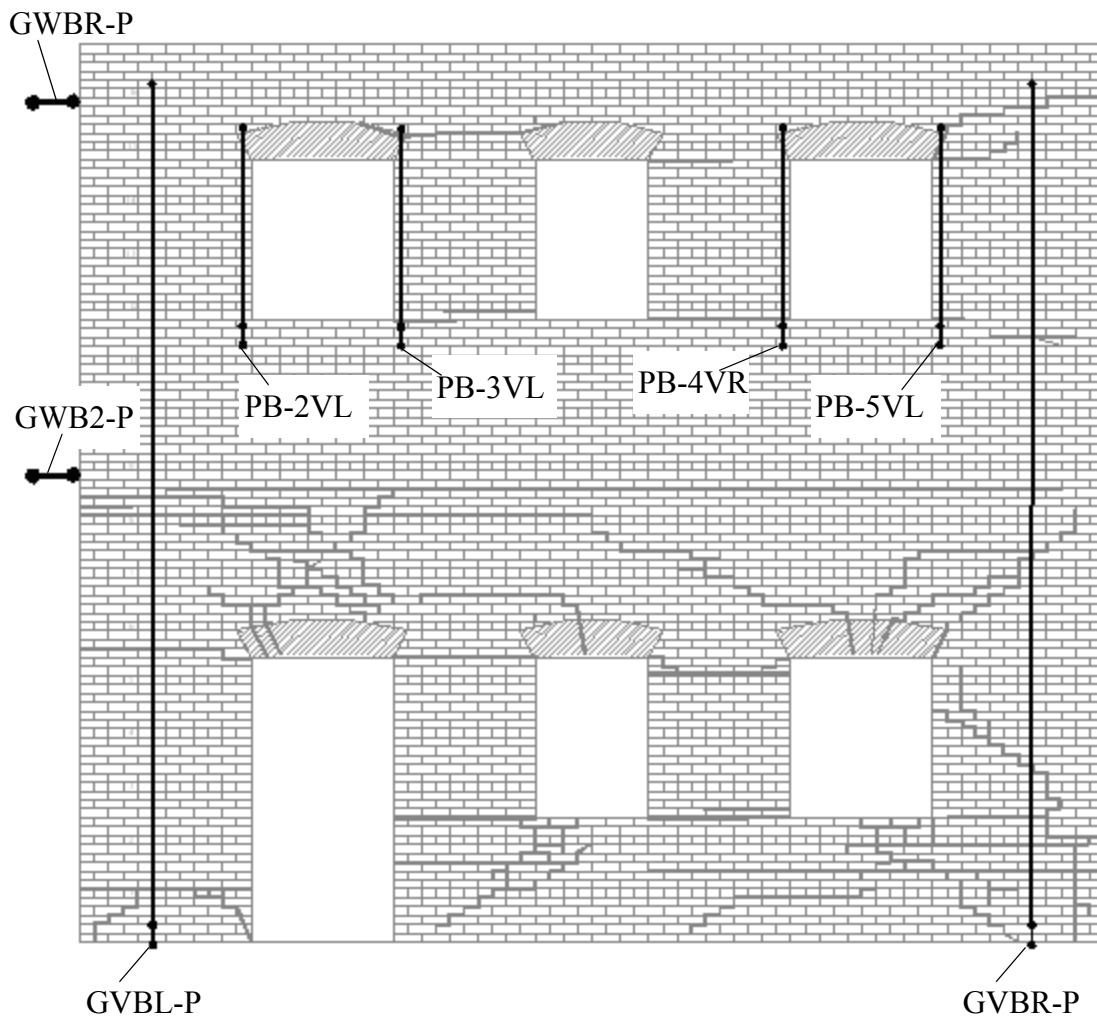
Elevation view of Wall B illustrating the location of potentiometers.
